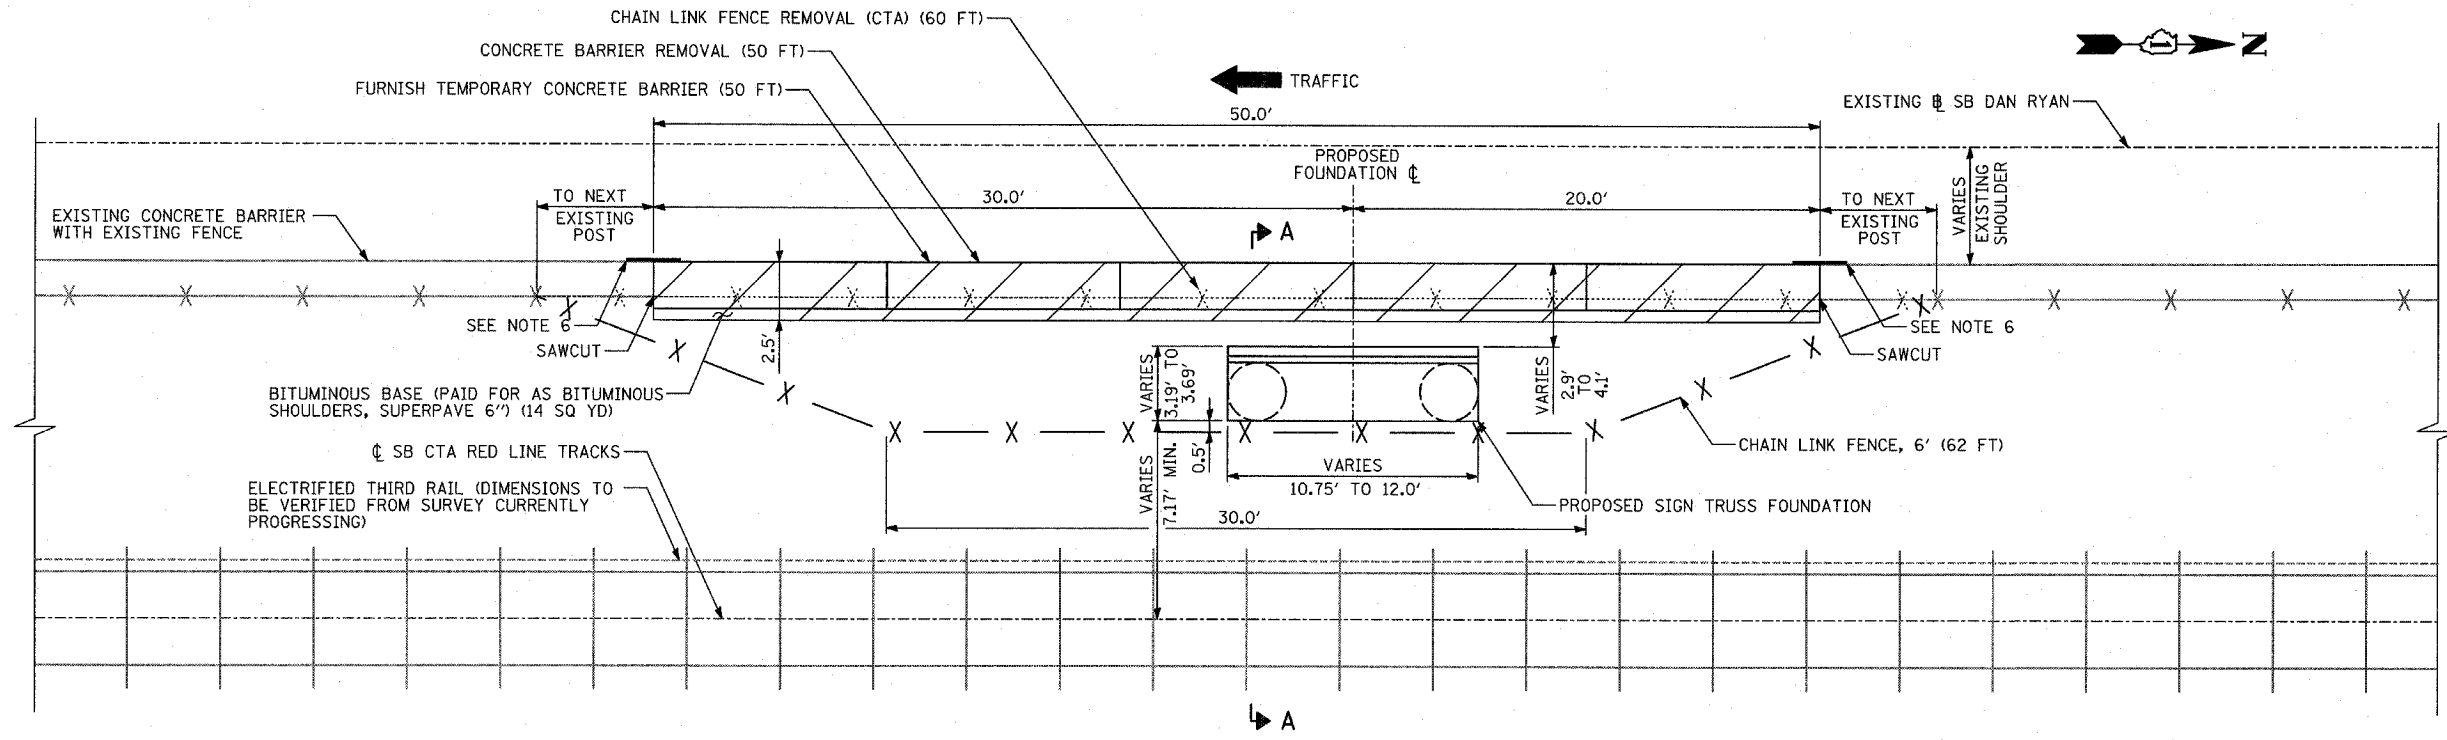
DETAIL "B": COORDINATE WITH CARRIAGE WALK "B"
